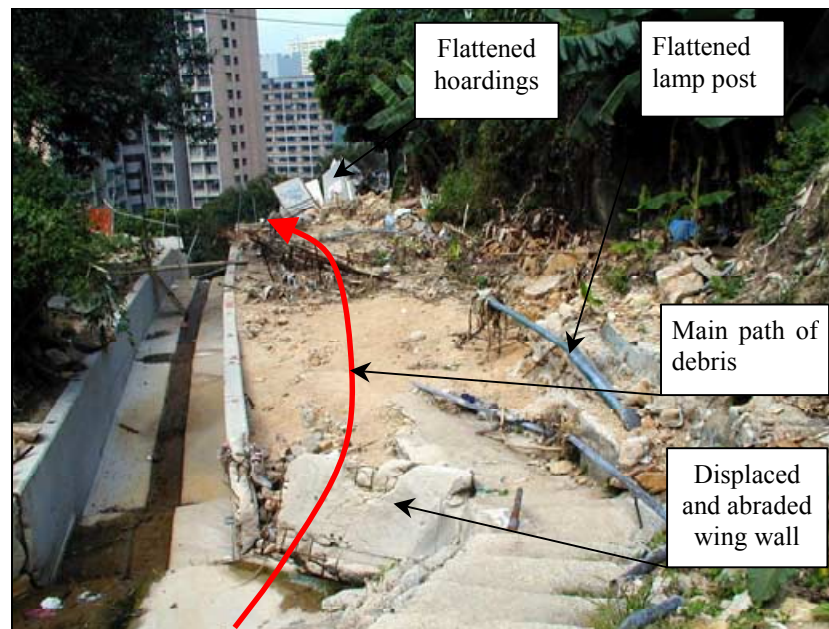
Upper Concrete Channel above Active Construction Site after the 1 September 2001 Landslide (Photograph taken on 17 October 2001)
